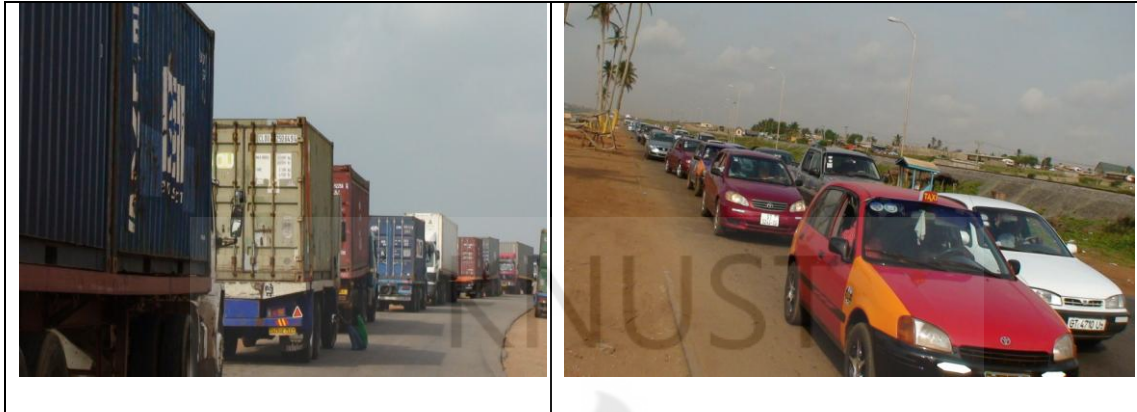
Images of Harbour Road (road signs, marking, walkways, laybys are absent)
